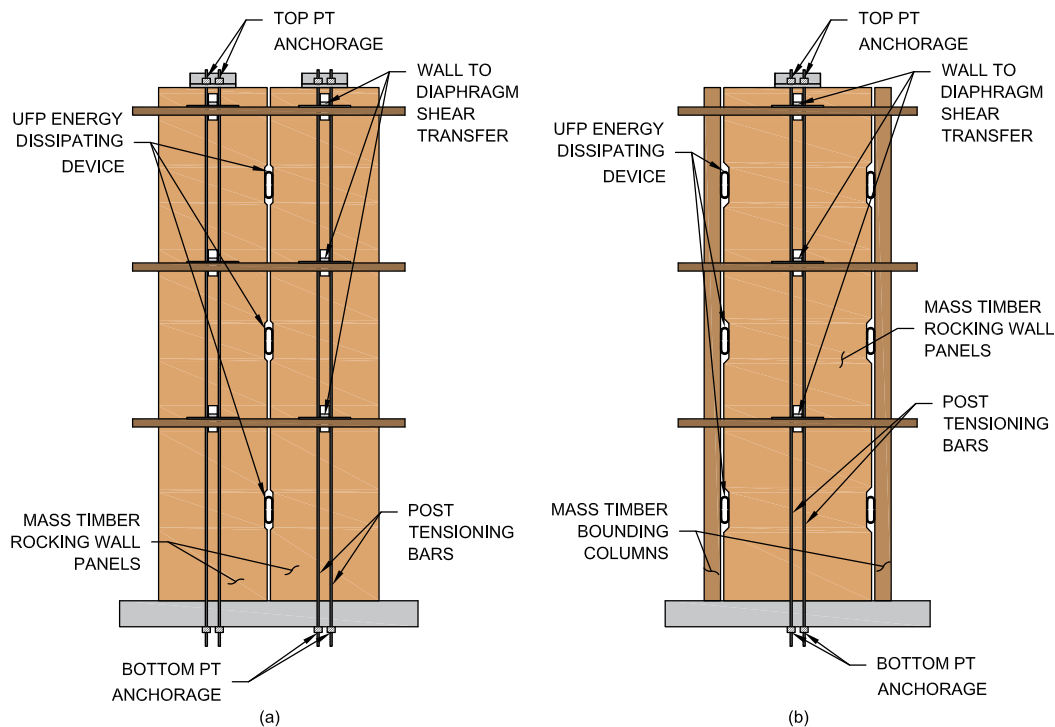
Wall systems (a) paired rocking walls and (b) rocking wall with bounding columns
